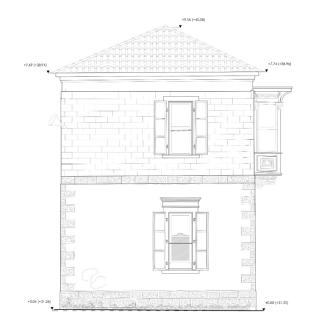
East facade of the house in Basmane (Source: Düzalan and Açan, 2016)
